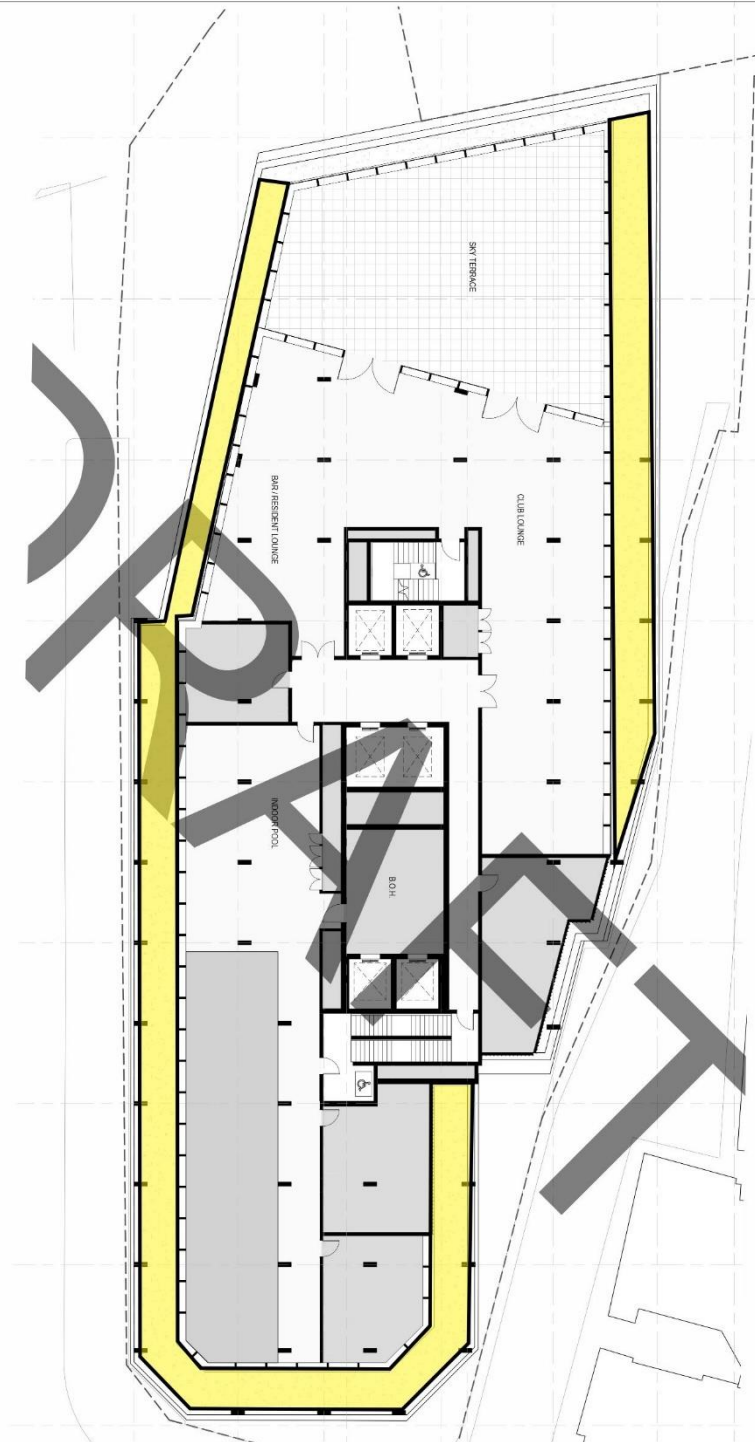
Further Modifications made to the 3D Massing Model Provided (Level 18 Plan)
